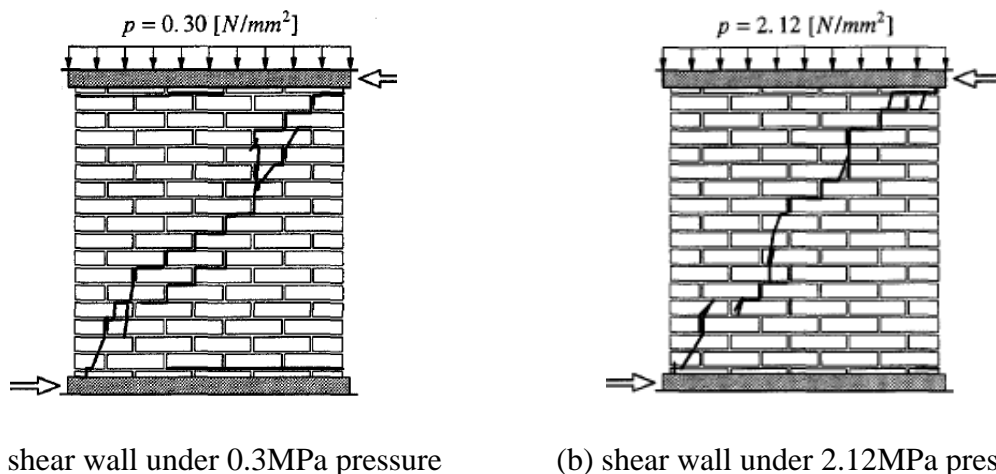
Loading conditions and failure modes of experimental walls (Raijmakers, 1992)
